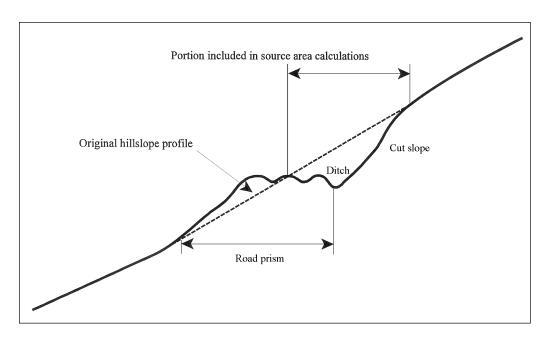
Cross section of a typical crowned road prism and the road surface area that typically contributes runoff to the inside ditch. Note the wheel ruts resulting from traffic use.
